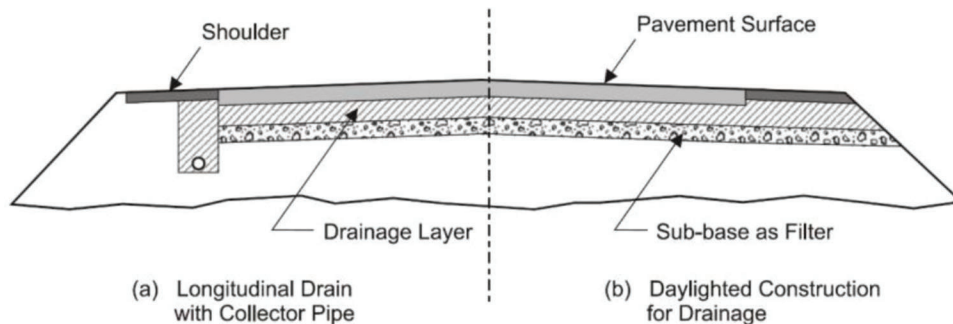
Typical pavement drainage system components (Huang, 1993).
